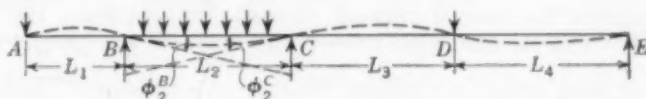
CONTINUOUS BEAM WITH ONE SPAN LOADED
